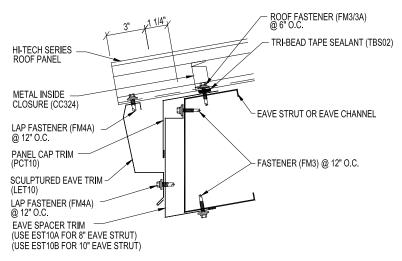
DETAILS W/ SIMPLE EAVE W/O SOFFIT
